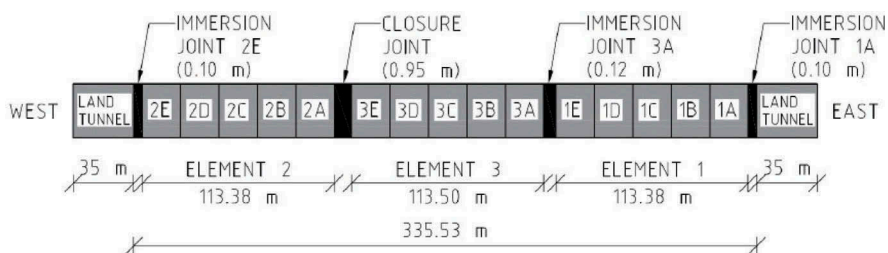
Long section through Kil tunnel showing the element locations, segment numbering and location of joints (from Rijkswaterstaat 1974).
